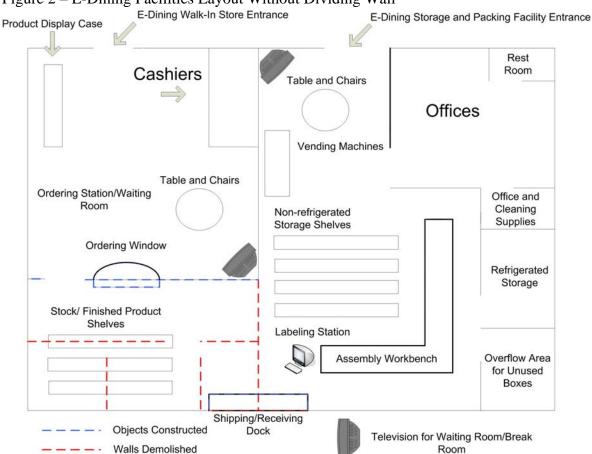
E-Dining Facilities Layout Without Dividing Wall
